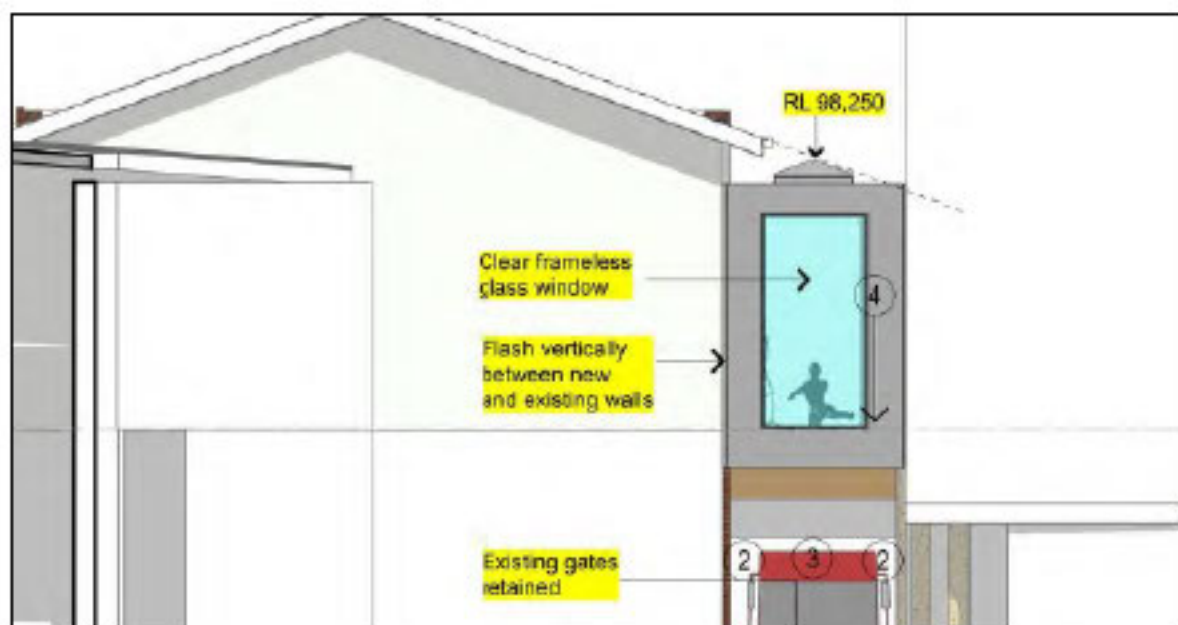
Proposed rear (east-facing) window facing Eden Street – needs to be modified to address privacy
